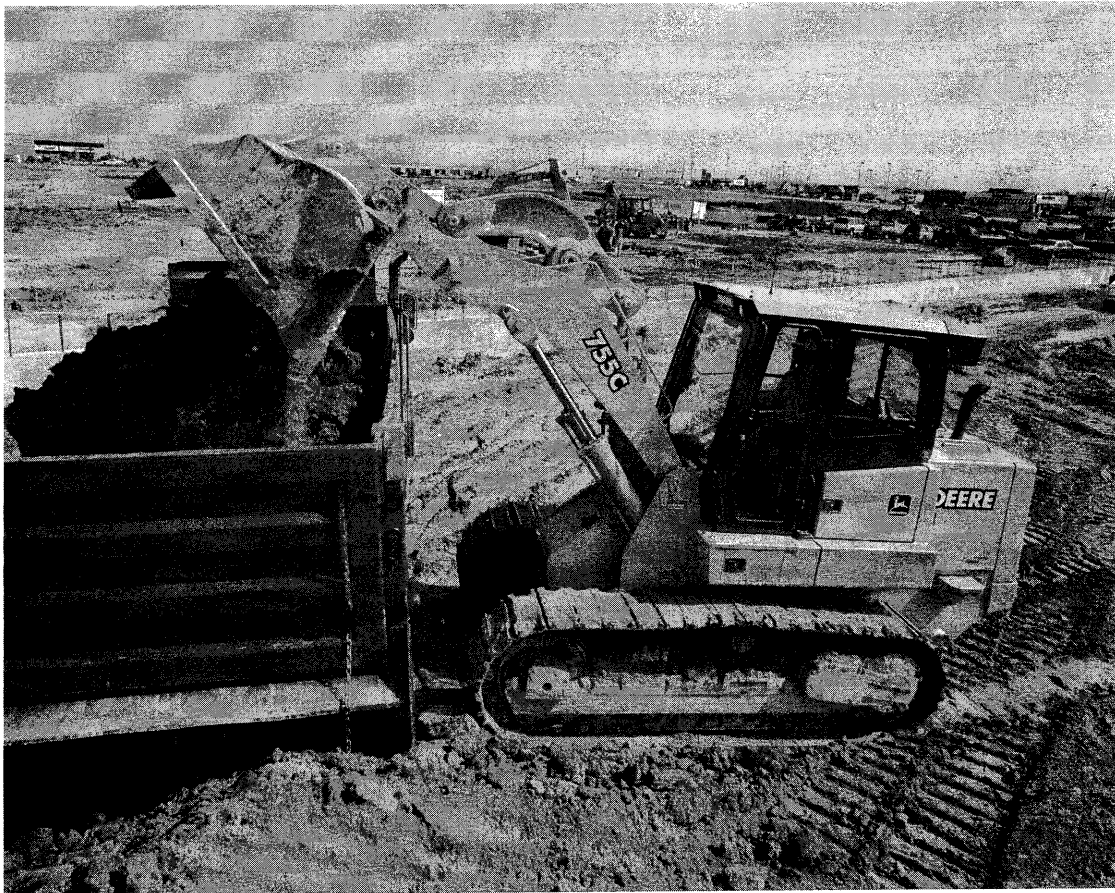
Track loader. (Courtesy of John Deere Construction & Forestry Company)
